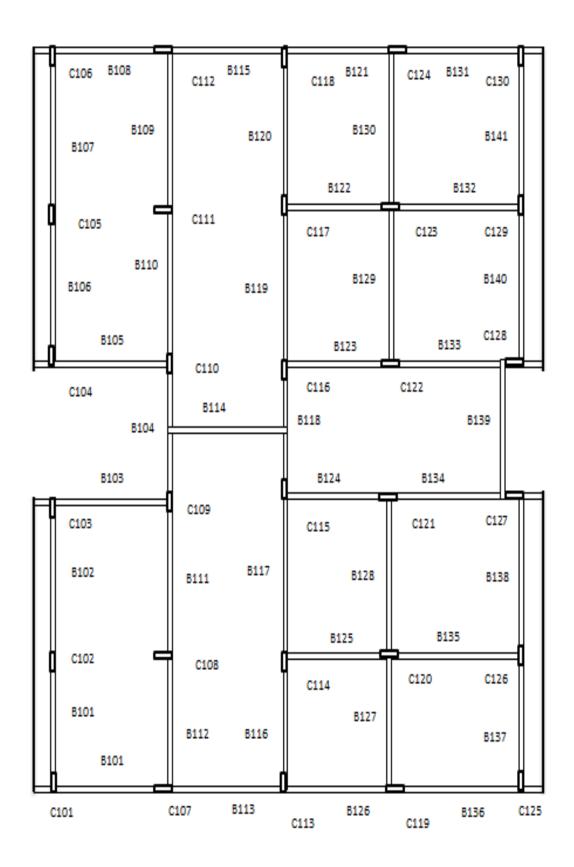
Building plan for floor 1, 2, 3, 4 for Case study II
